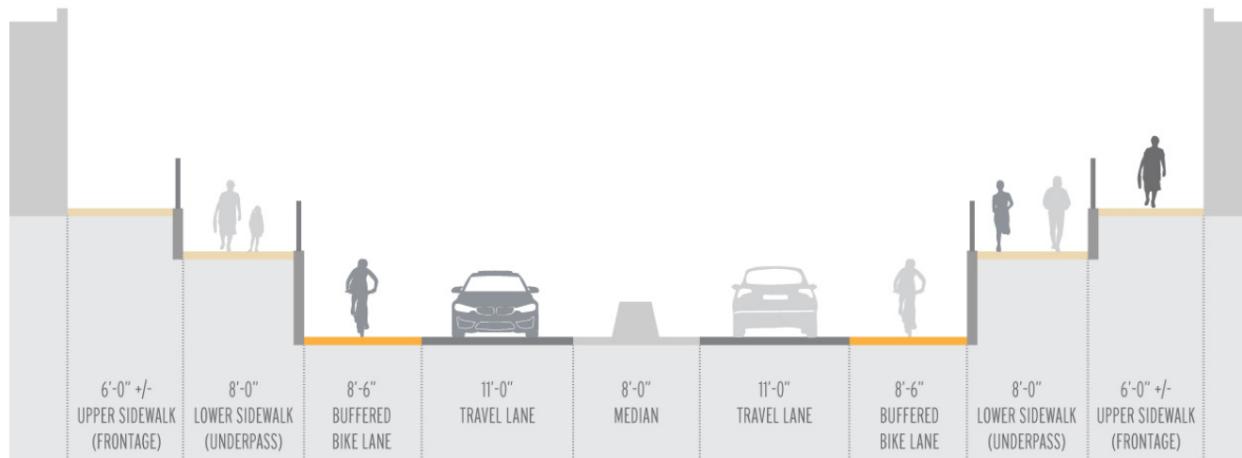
Greenwood Avenue Concept 2: Cross Section B
